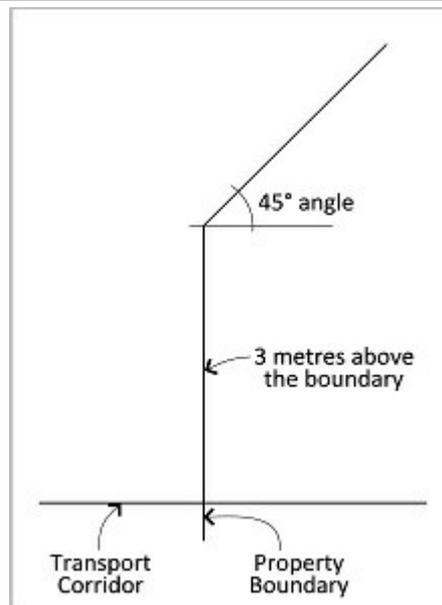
a: Height control plane for a boundary adjoining a transport corridor or access
